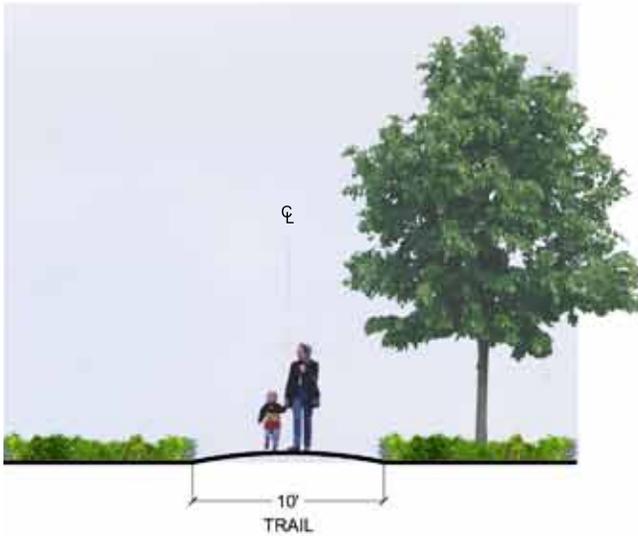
Conceptual Section and Plan: Dresden Road Bike Boulevard Closure
